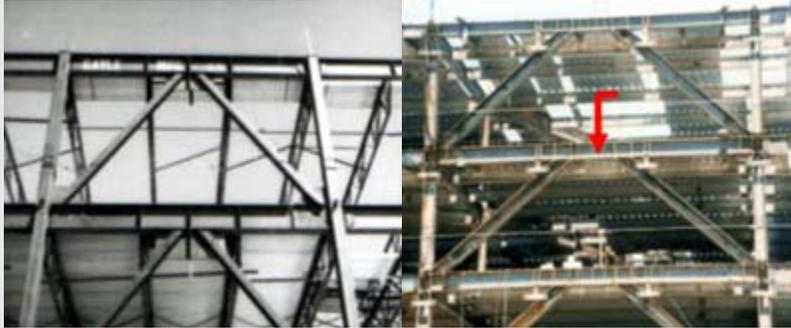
Left: Concentric Braced Frame and Right: Eccentric Braced Frame, with link beams
